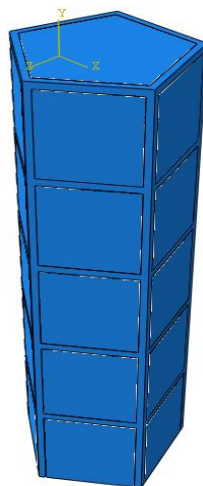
Definition of geometric constraints between components and placement of walls and ceilings on the skeleton
